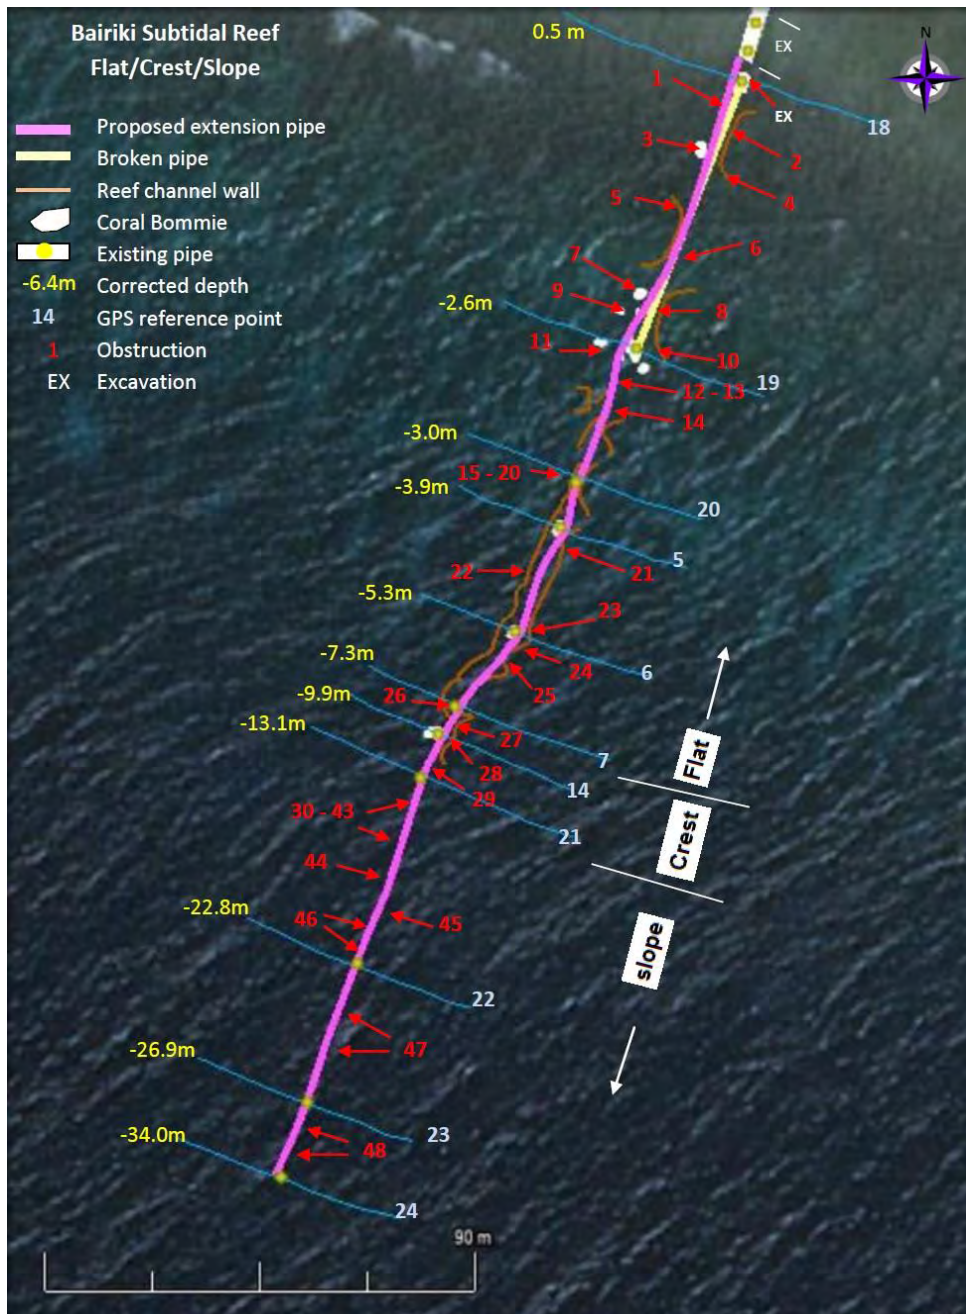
Features and Obstructions along the Existing and Proposed Bairiki Outfall Route (digitized by SMEC)
